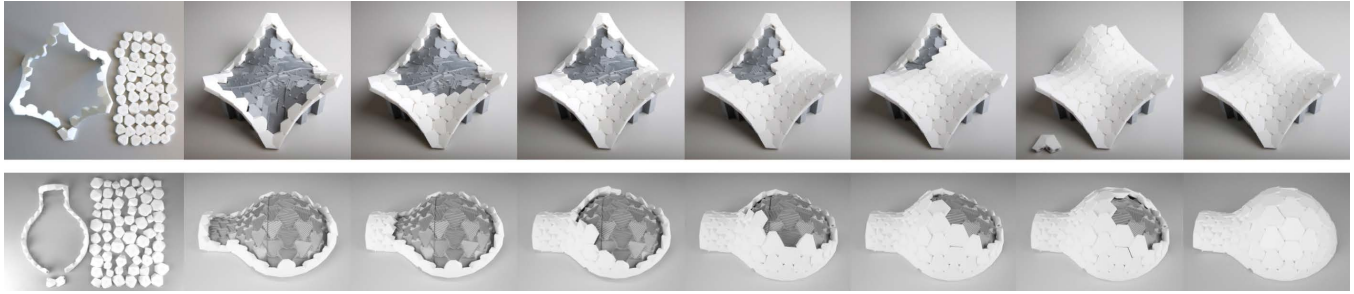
Assembly sequence of (top) Roof and (bottom) Igloo, where the blocks and the boundary frame (in two components) are shown on the left. 3D printed formworks are used to support incomplete structures during the assembly.
